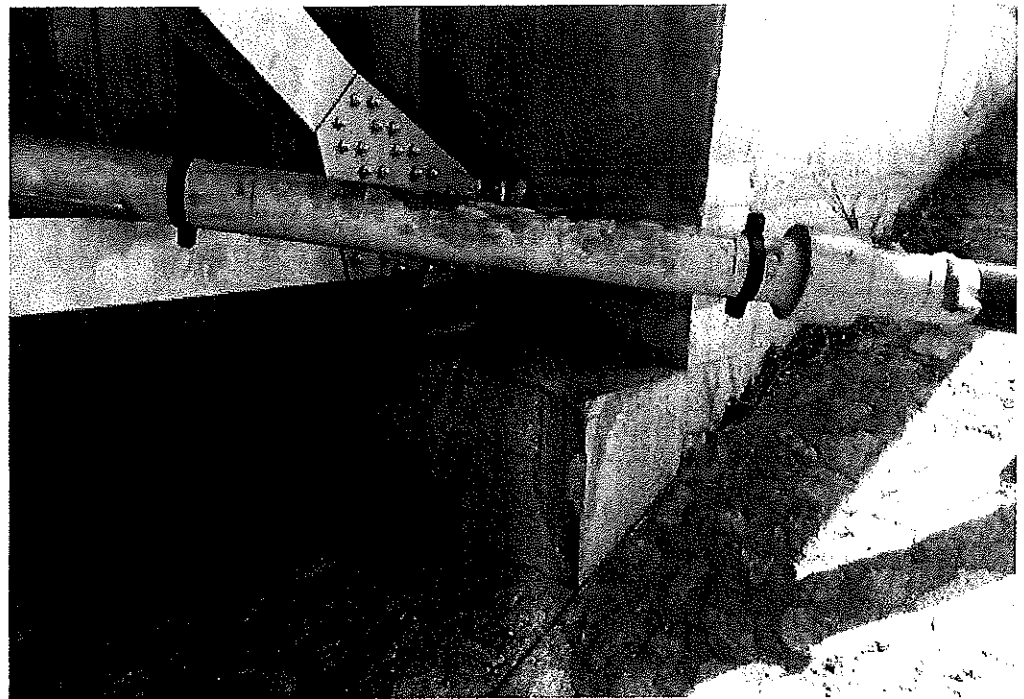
Yapei Bridge. Detail of support on abutments and water pipe crossing the bridge.
